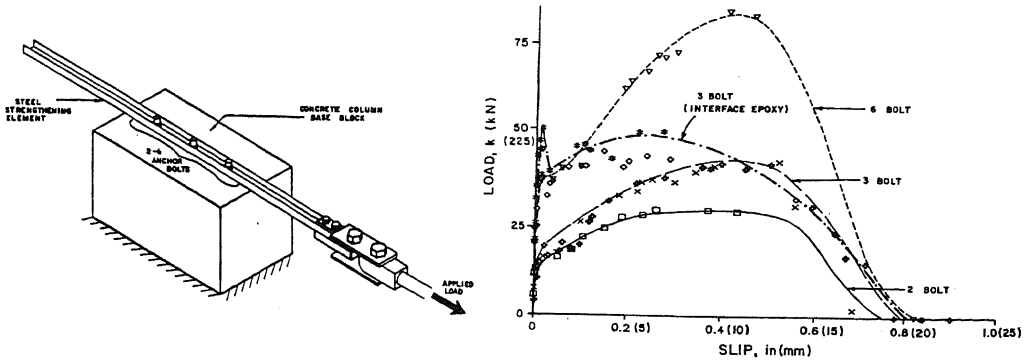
Steel to concrete connection test specimens Fig. 8 Load-slip envelopes for steel to concrete connections.
